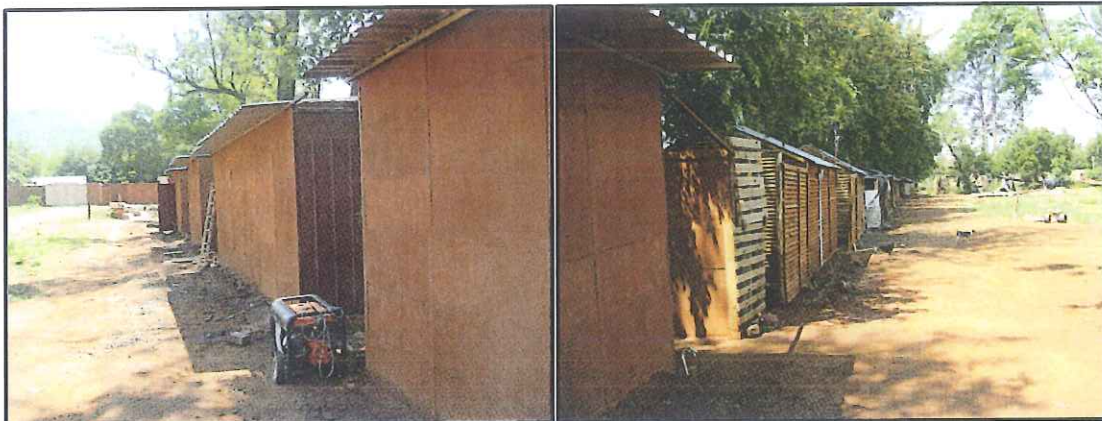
Smaller housing units (pre-cast left and wood right) and internal road
